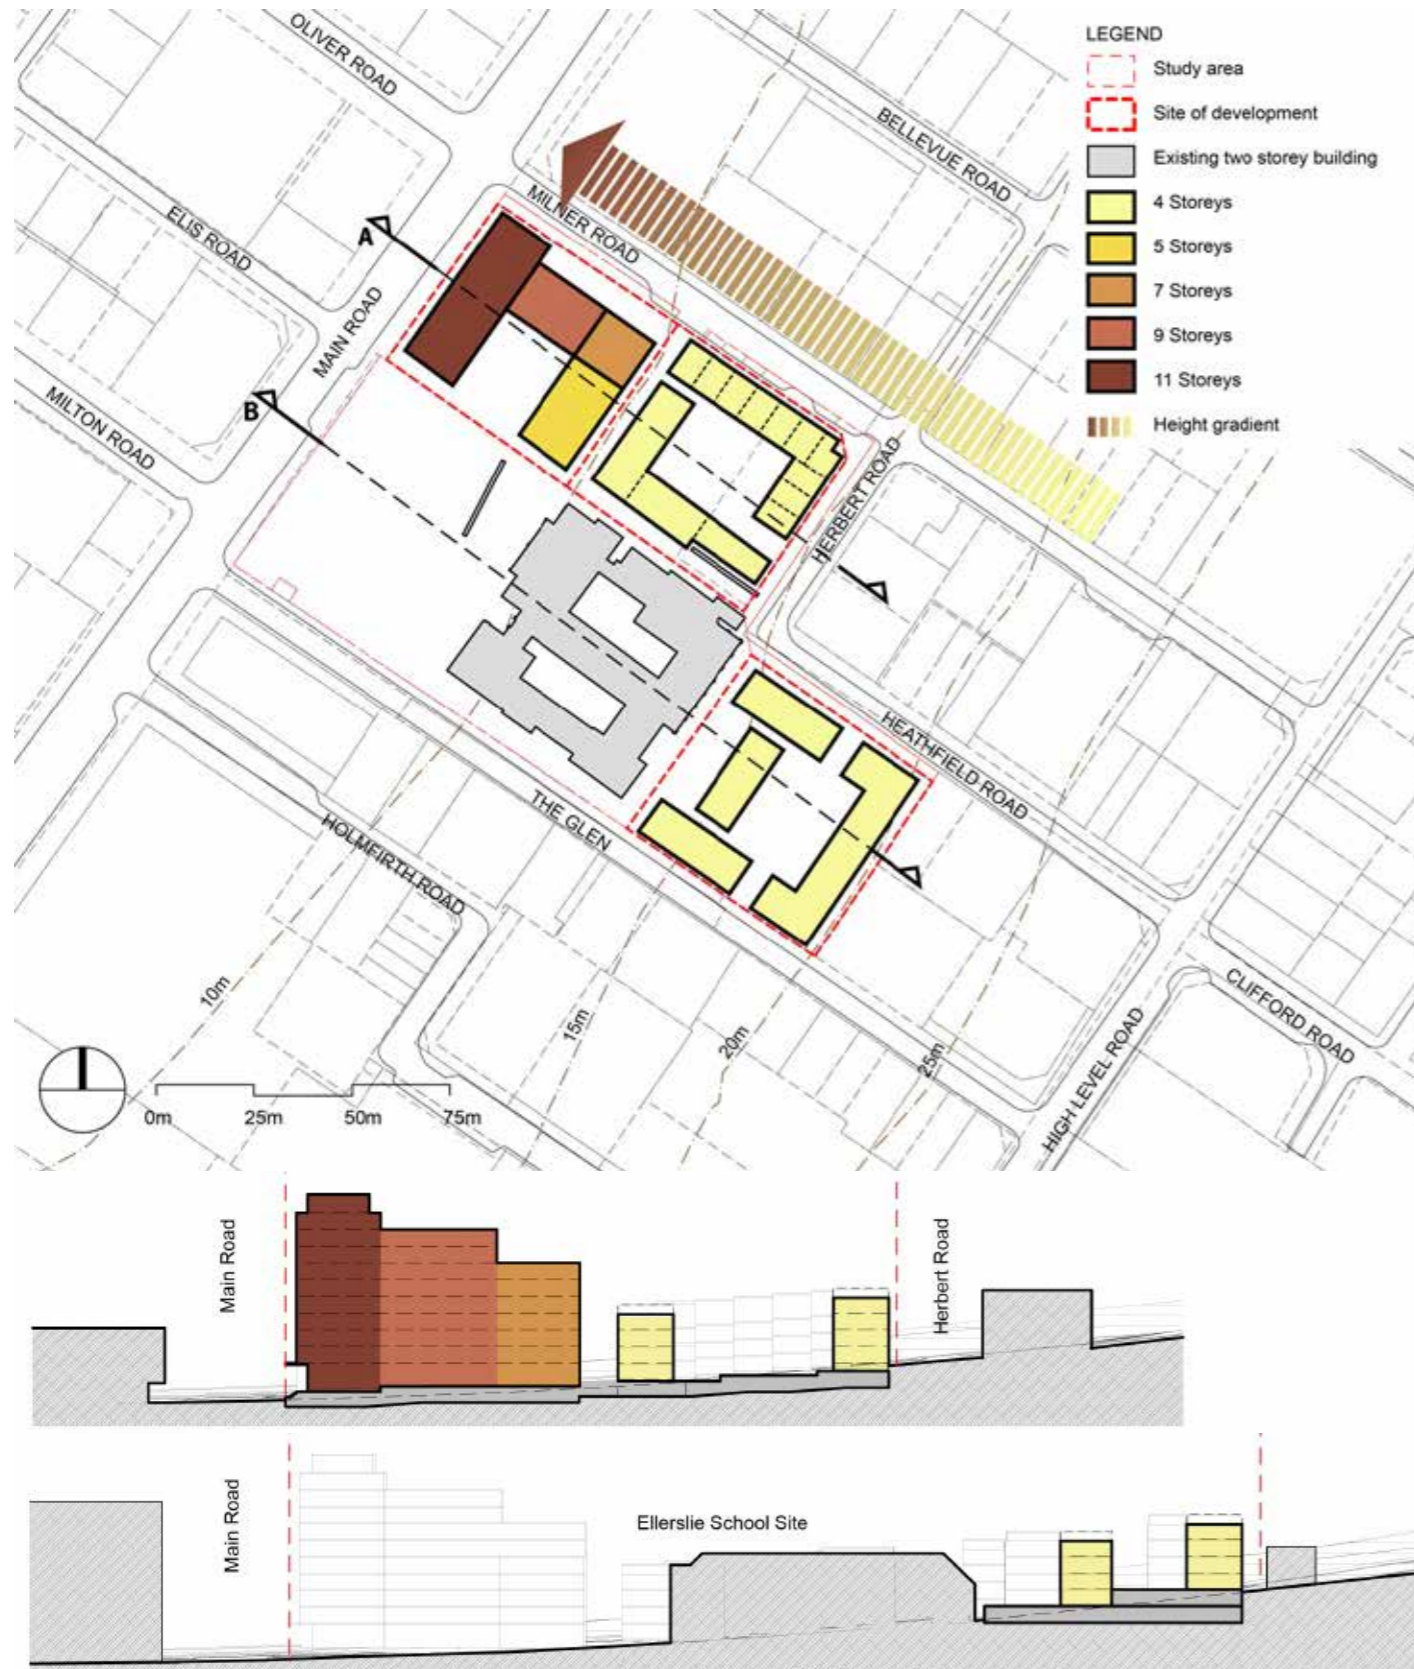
Proposed height distribution across the site (top) and sections through site (below) (Zutari, 2025)
